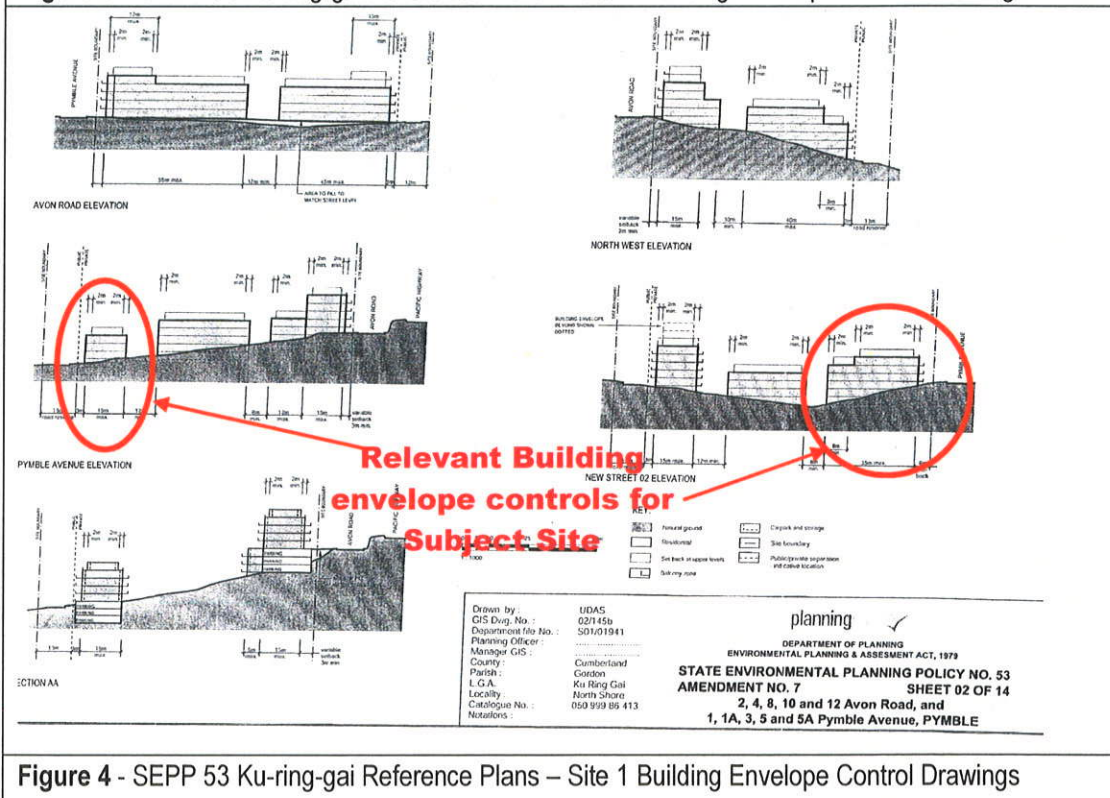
SEPP 53 Ku-ring-gai Reference Plans – Site 1 Building Envelope Control Drawings
